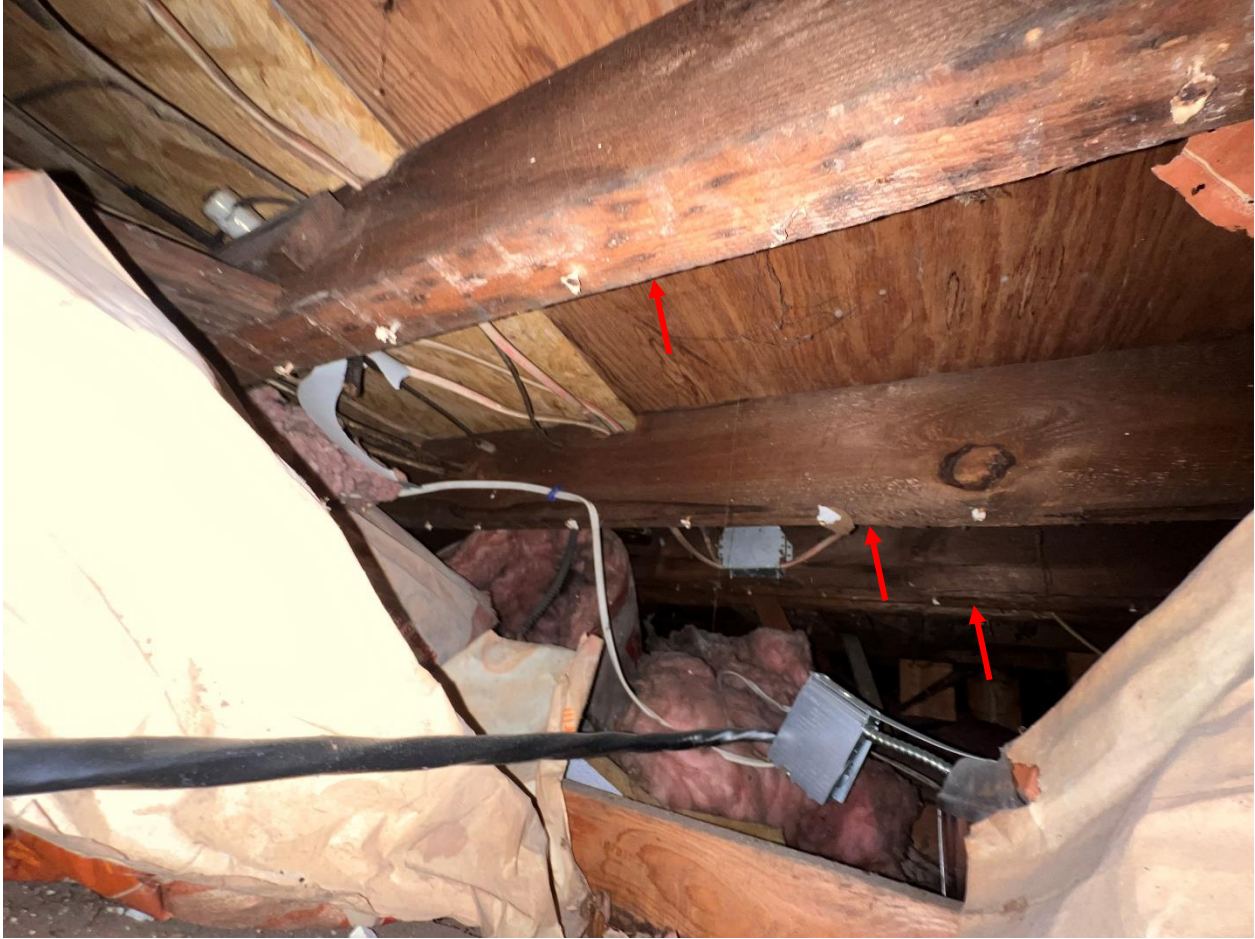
The Second Level floor joists (red arrows) spanned in the east-west direction between load bearing walls.
